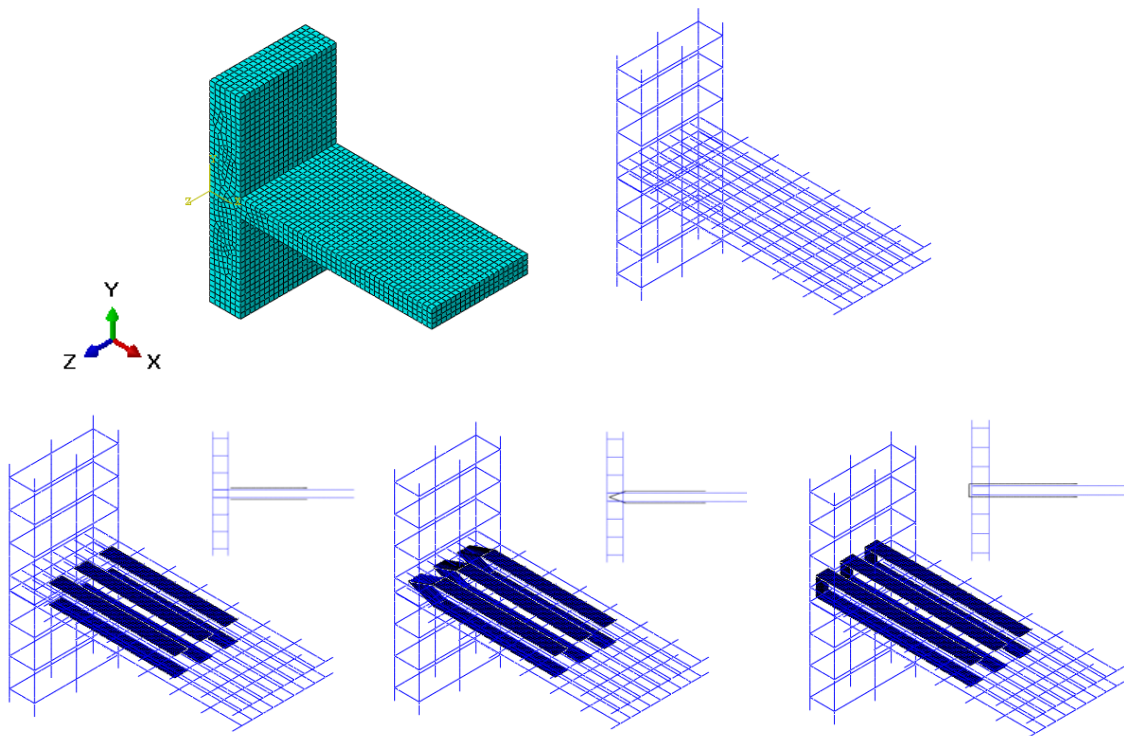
The FEM model used for the RC wall/slab connections and details of steel rebars and FRP in each connection
